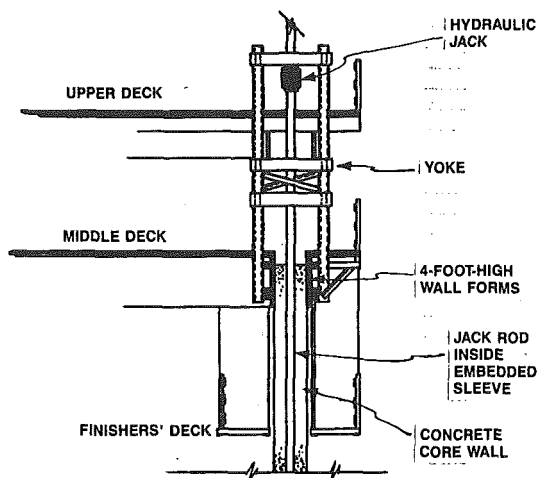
Three Working Decks in Core Construction (Courtesy of Concrete Construction)
